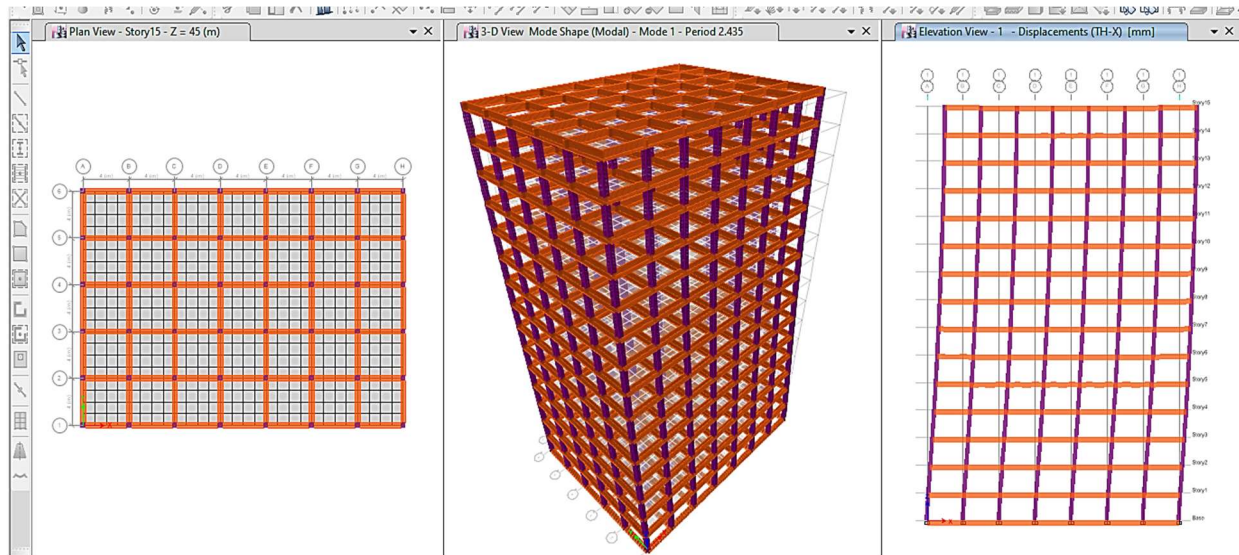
Plan, 3D & Elevation view of fixed base rectangular plan building
